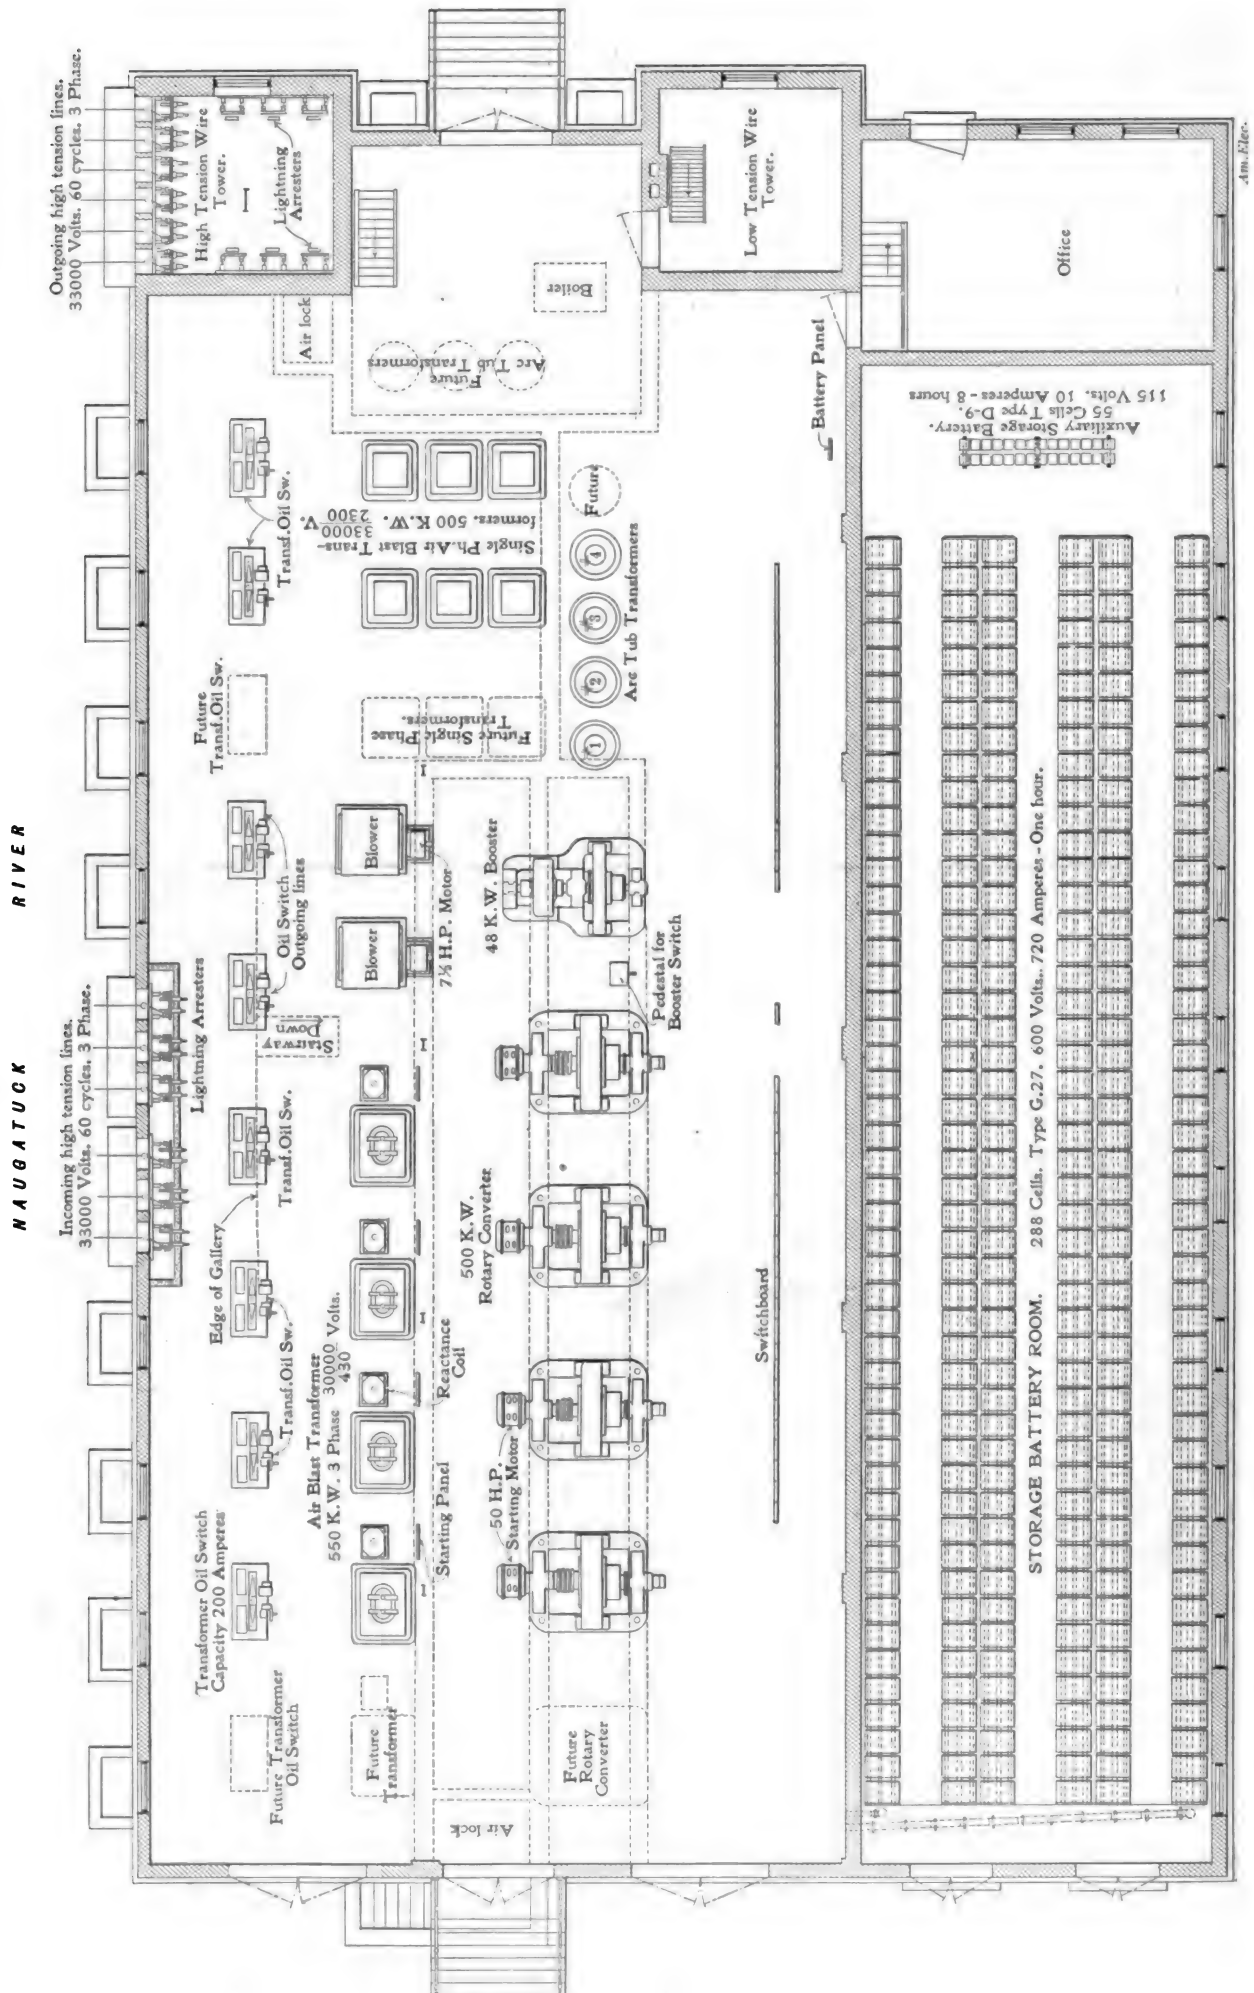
PLAN VIEW SHOWING LAY-OUT OF APPARATUS IN WATERBURY SUB-STATION NO. 1.
